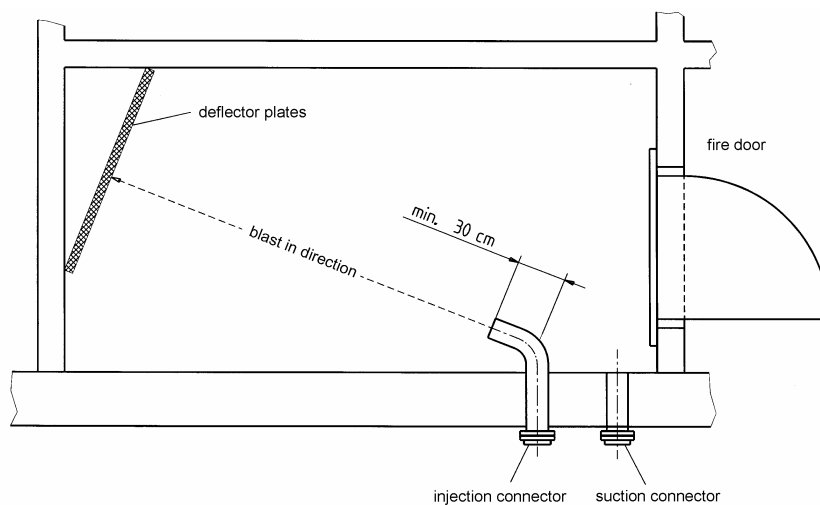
Pellet storage room with diagonal injection connector end for better filling of the storage room
